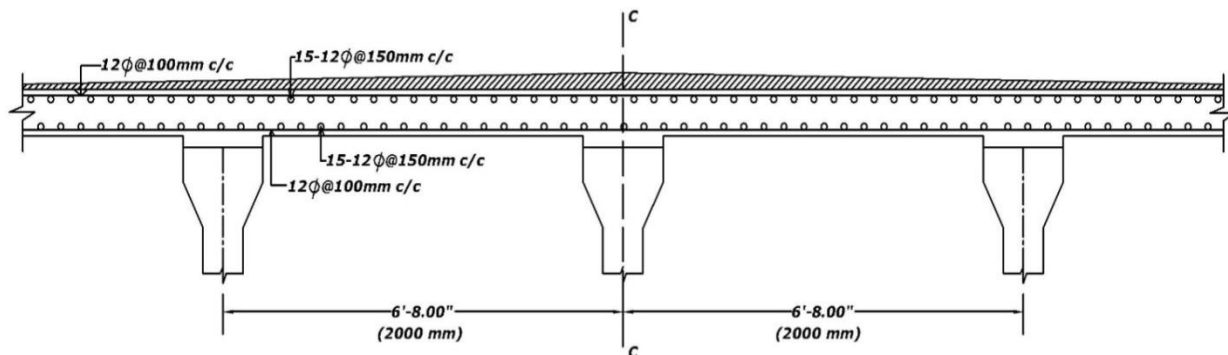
Reinforcement Details of a Typical Bridge Deck of a Span of 27m (Roads & Highways Department, Bangladesh, 2016)
